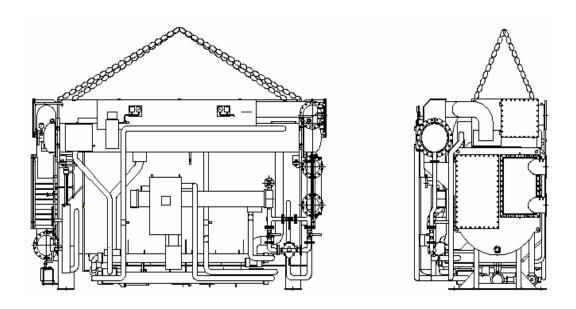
Rigging The Unit, Typical, Side and End Views
